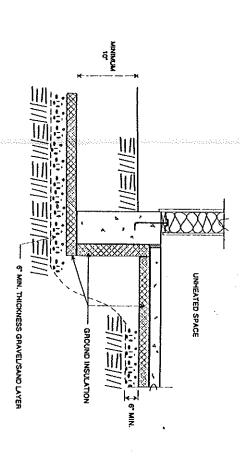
FPSF Design for Unheated Space with independent Slab and Stem Wall.
